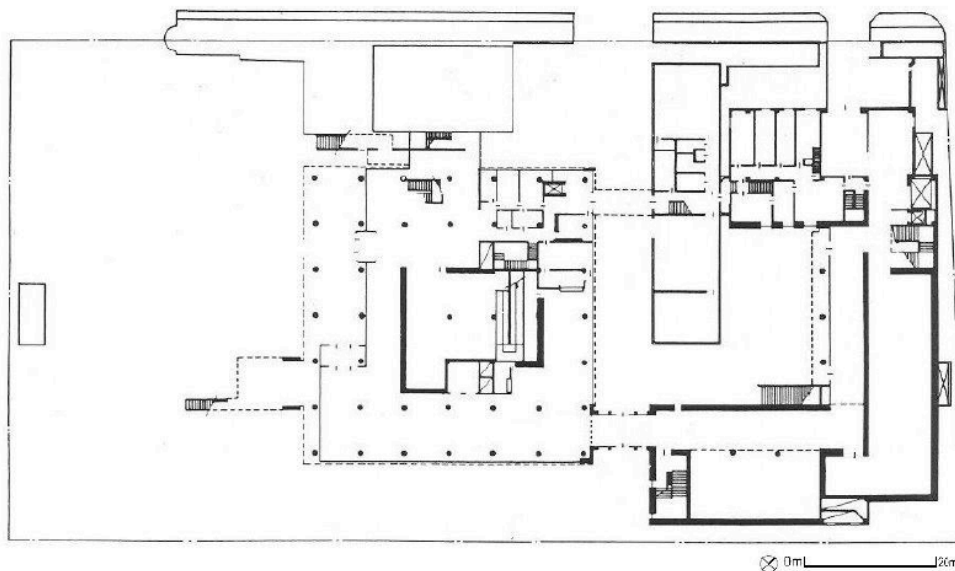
Ground floor plan after the 1979 annexation of the Tokyo Museum of Western Art.
